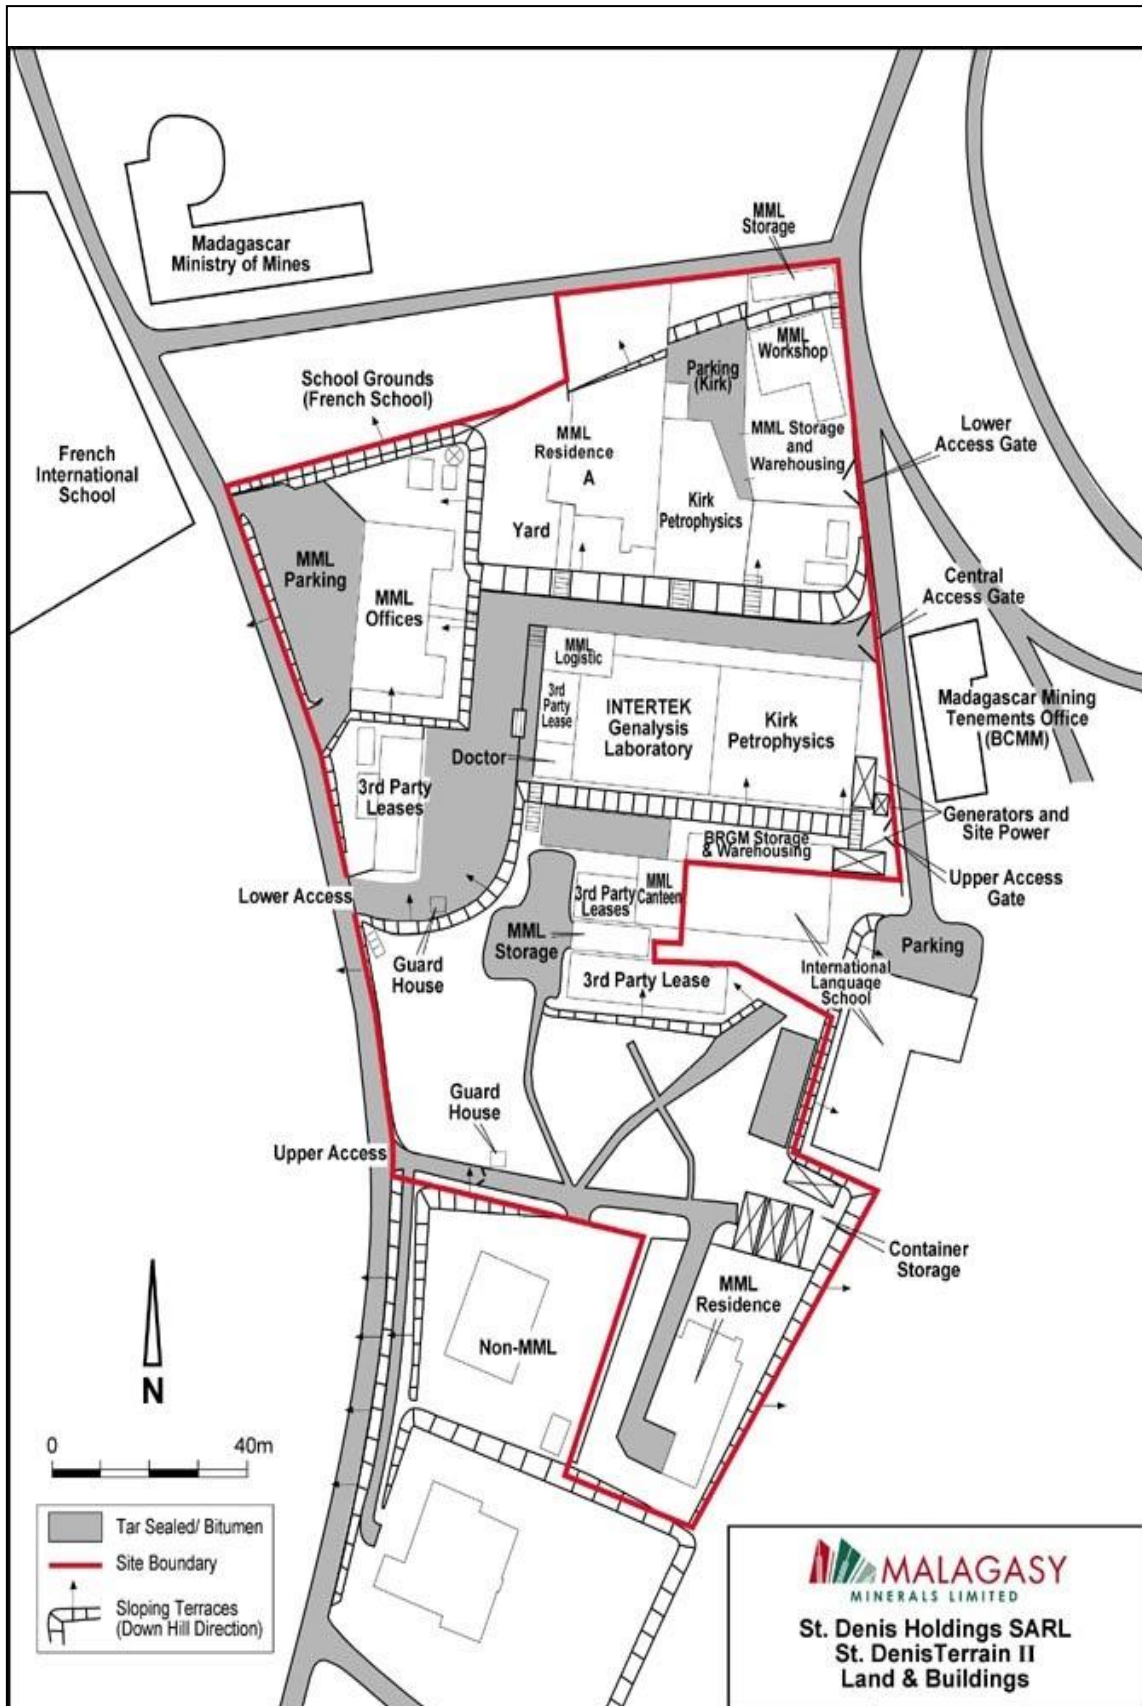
Plan of St. Denis Terrain Showing Location & Extent of Building Infrastructure
